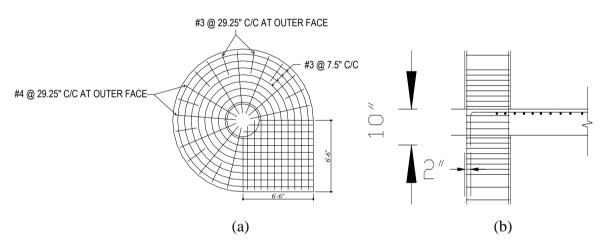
(a) Reinforcement details of stair at section C-C, (b) Magnified view of reinforcement details of column and stair.
